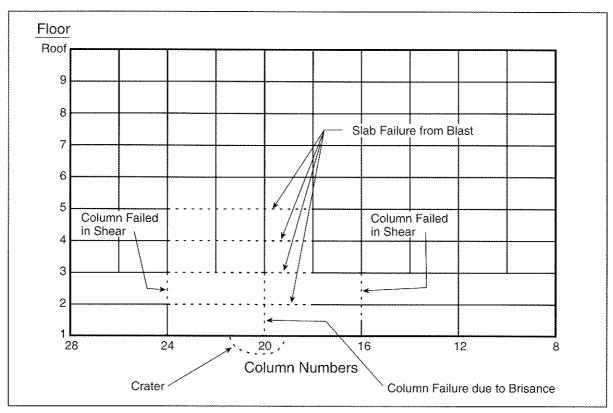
Schematic of blast response, north elevation of nine-story portion of Murrah Building at Column Line G.
